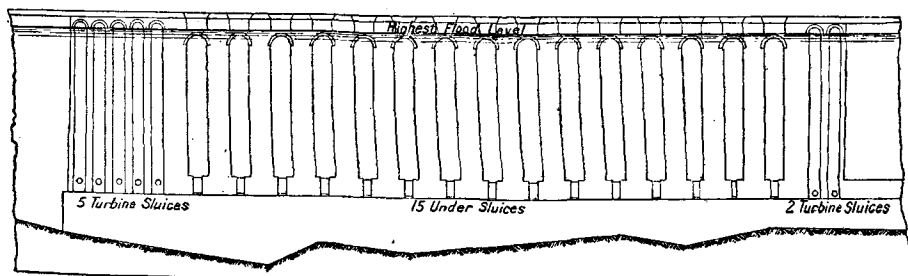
Elevation of part of Bhatgarh Dam.
